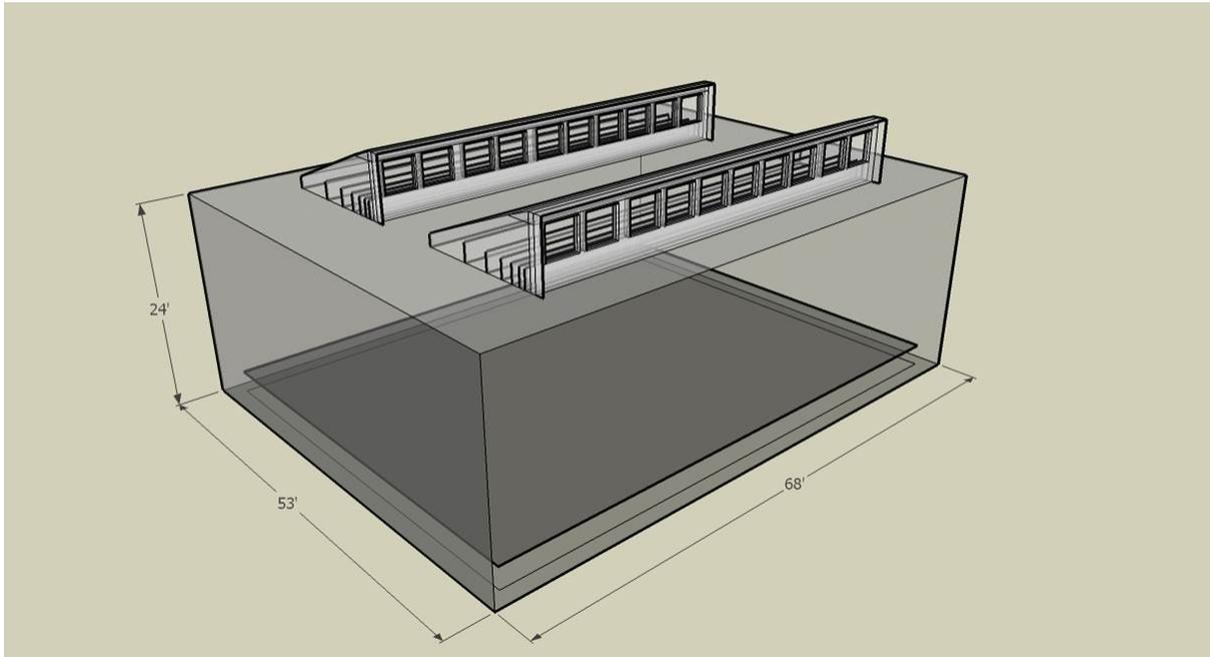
Gym with south-facing roof monitors – view from southwest
